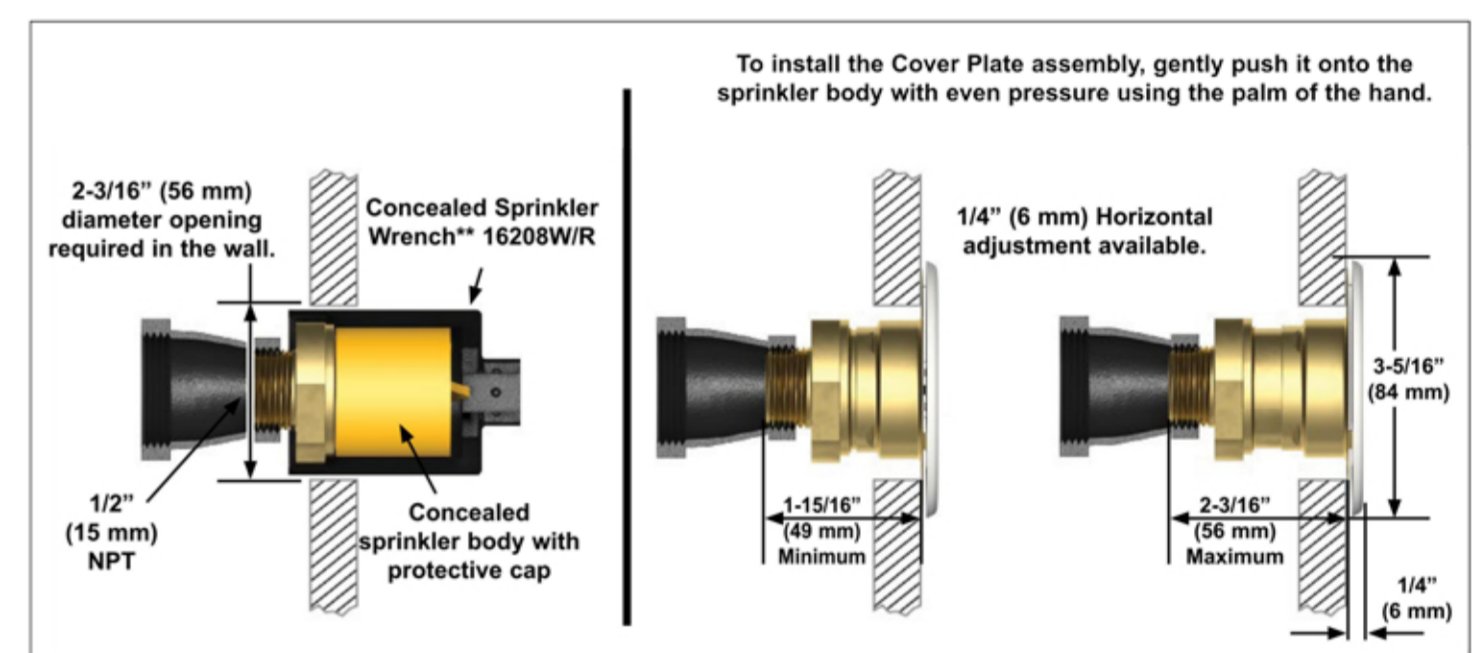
Sprinkler VK480 Dimensions and Cover Installation
